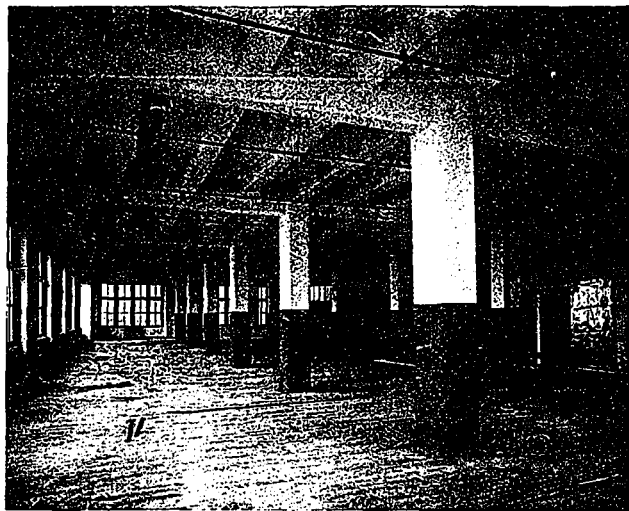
INTERIOR VIEW, SECOND FLOOR, OGILVIE BUILDING, TORONTO, SHOWING STEEL GIRDERS AND COLUMNS ENCASED IN CONCRETE ON EXPANDED METAL LATH, ALSO THE REINFORCED CONCRETE JOIST BEAMS. THE LARGE WINDOW SHOWN HAVE METAL SASH AND FRAME AND WIRED GLASS.
